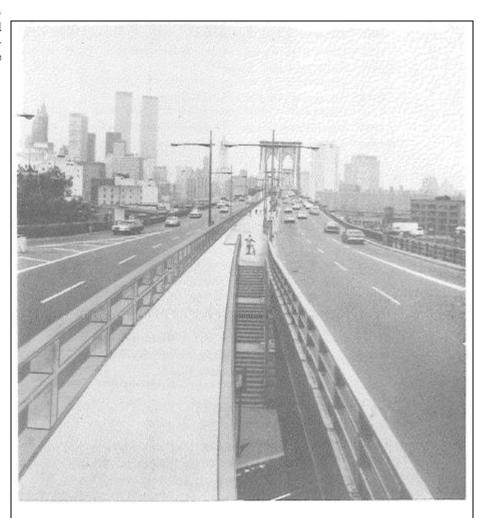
Brooklyn Bridge: projected Bike Path leading to Tillary Street
